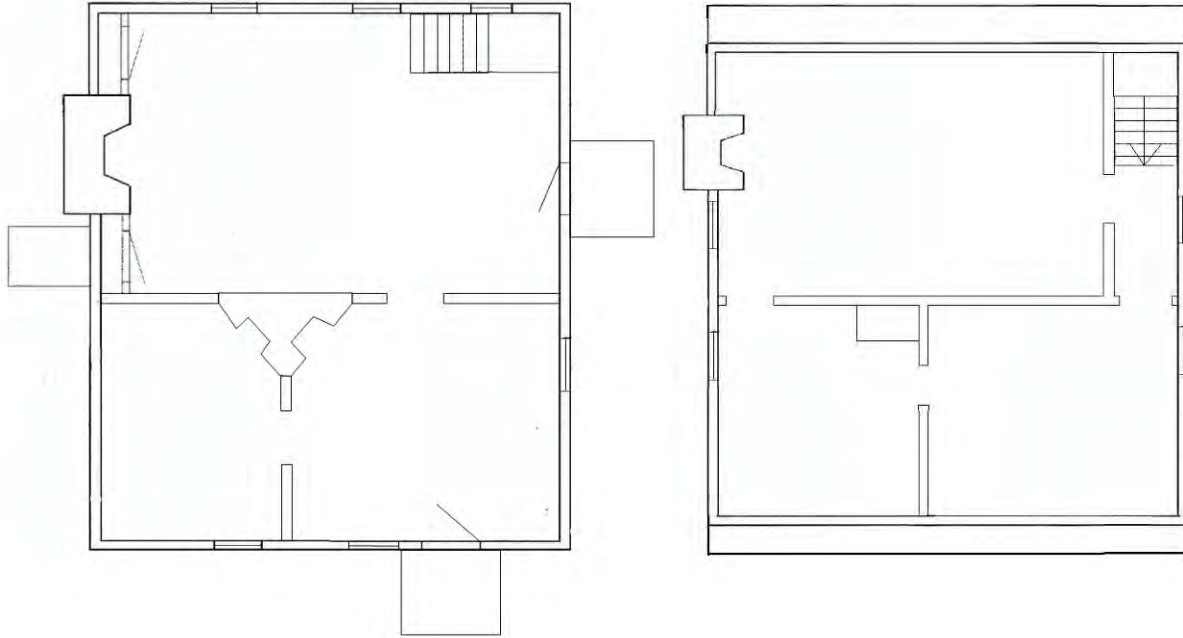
Conjectured original layout, first floor (Left) and second floor (Right). Oriented with north upwards.
